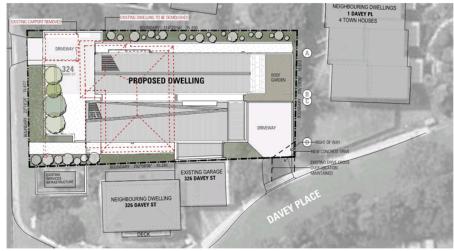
The approved site plan of the 2017 proposal, showing the smaller deck and roof garden at the rear, that is now proposed to be a deck in entirety.
